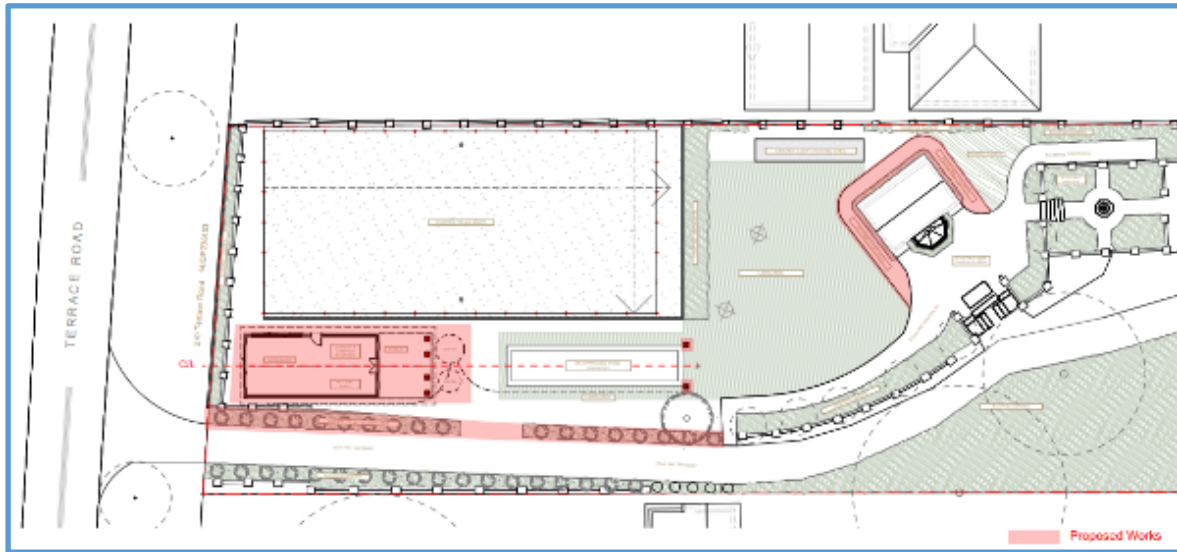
Site plan indicating location of existing concrete slab/proposed outbuilding and paving.
